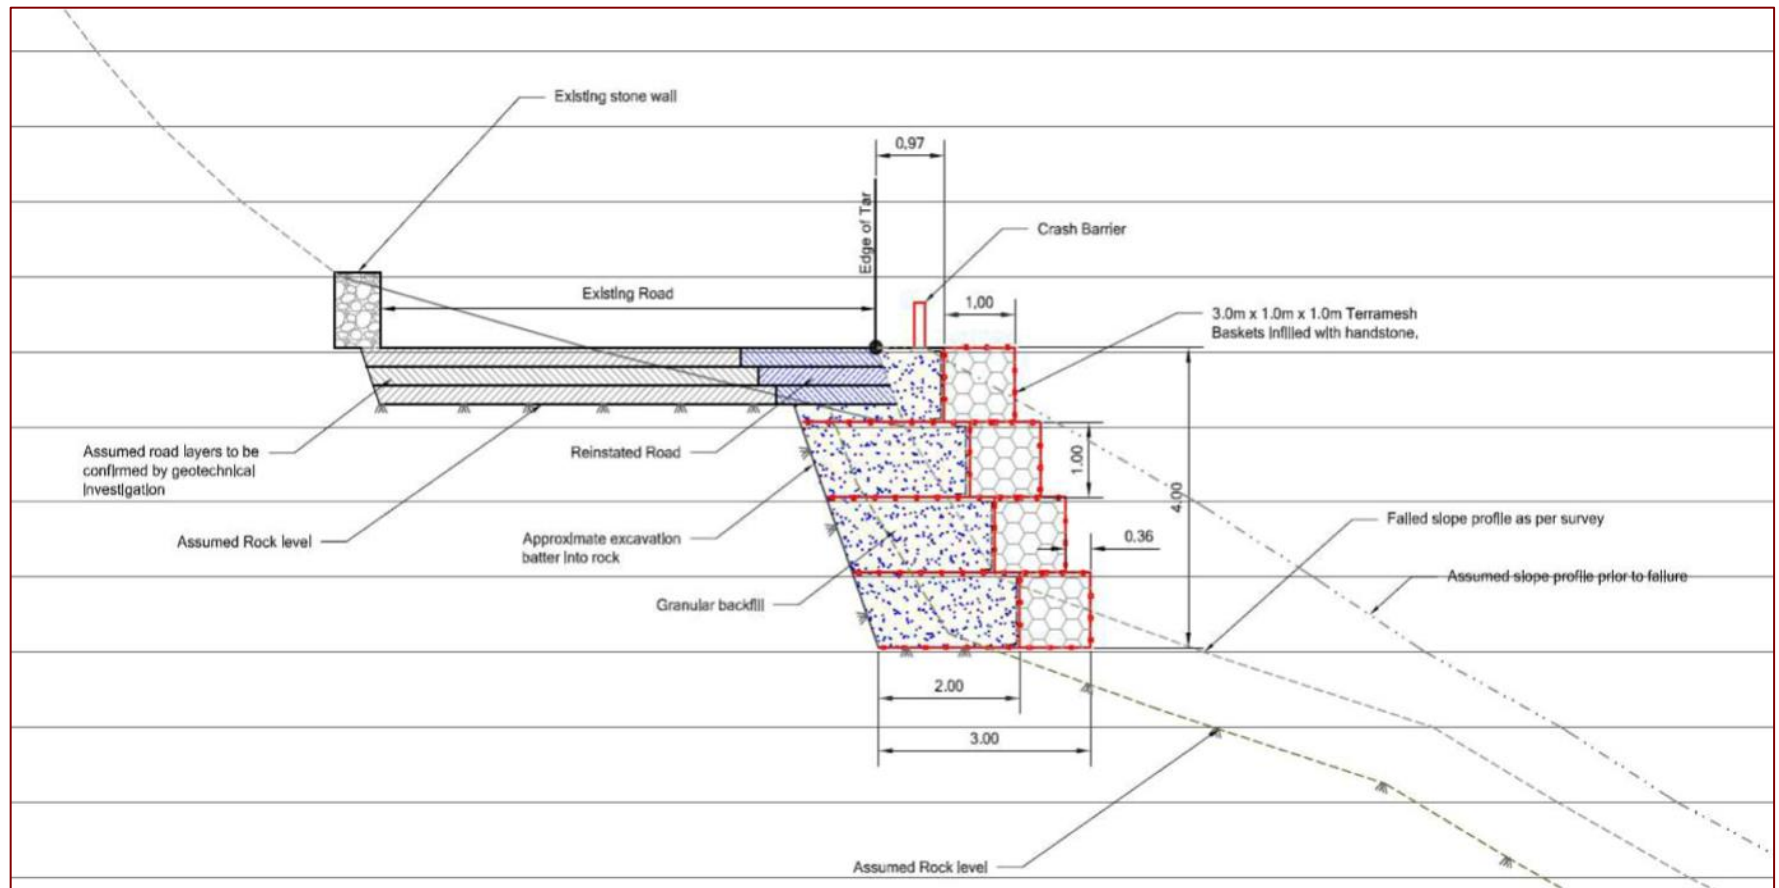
ALTERNATIVE 1: Terramesh retaining wall concept (Ingerop, 2024)
